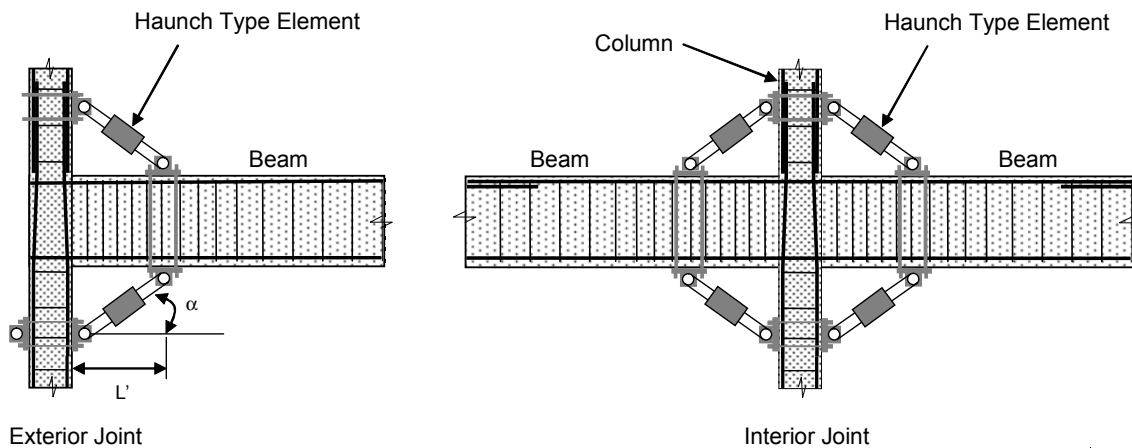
Proposed haunch retrofit configuration for exterior and interior joints
